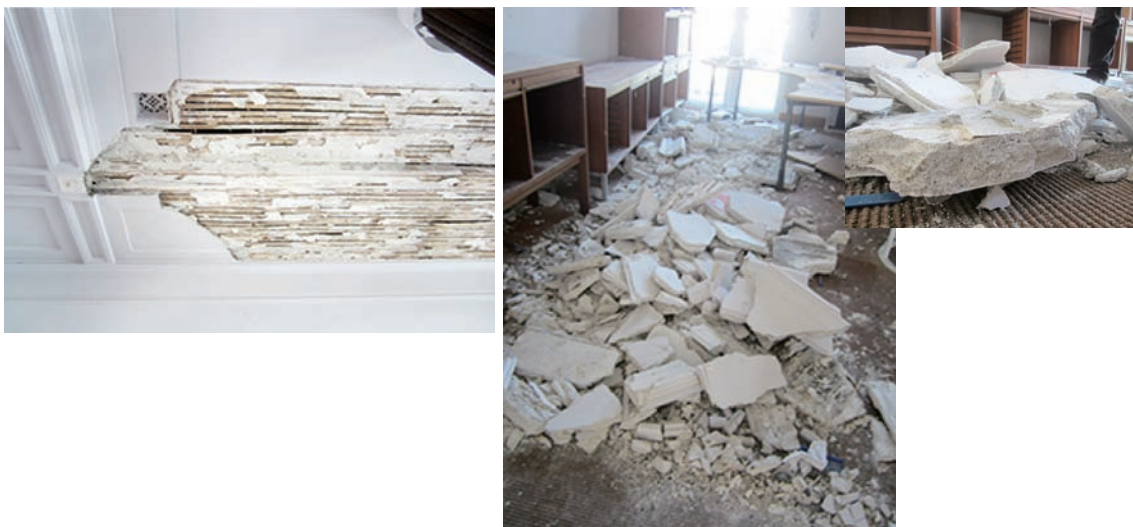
The plaster on the wood-lath ceiling of a second-floor office fell down.
